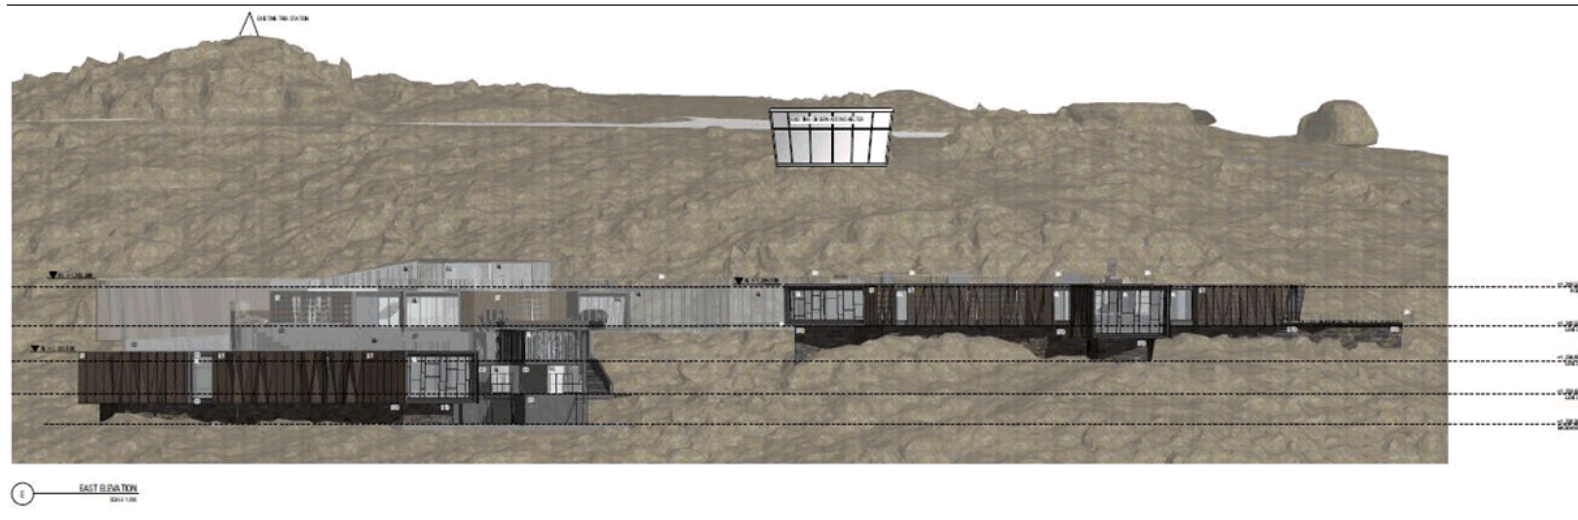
Building design from perspective of eastern elevation, showing north and south sections of the building, the adjoining enclosed glass walkway, and the proposed obstructions on eastern face windows that may have posed a reflective risk
